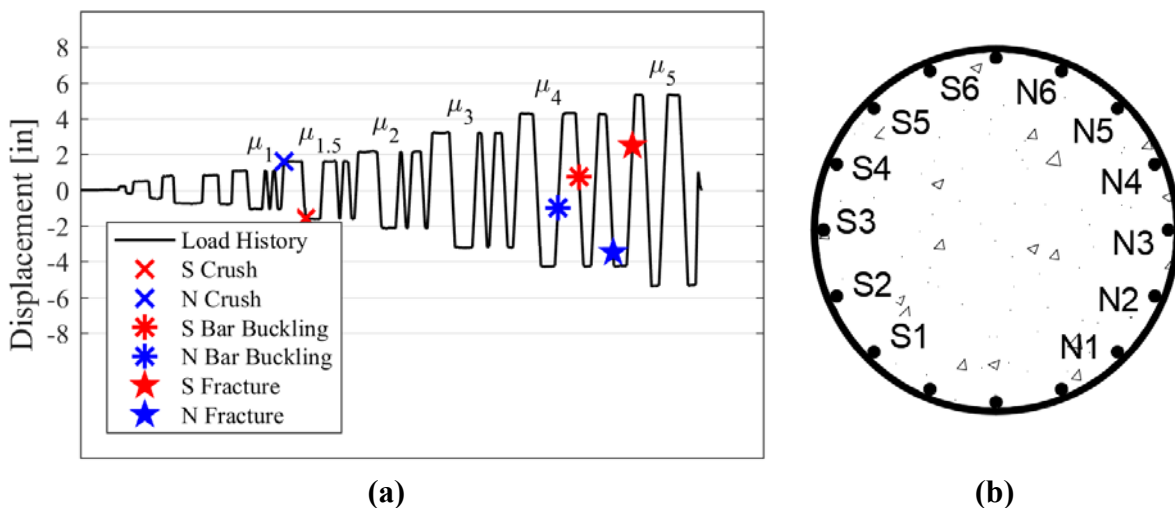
(a) Column test 3 load history. (b) Column test 3 bar labels
